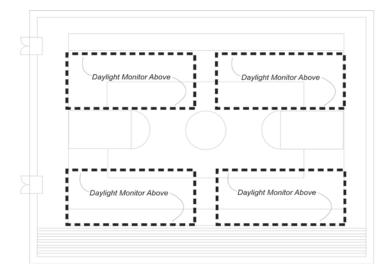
Typical 7600 ft<sup>2</sup> gymnasium floor plan with four roof monitors.
